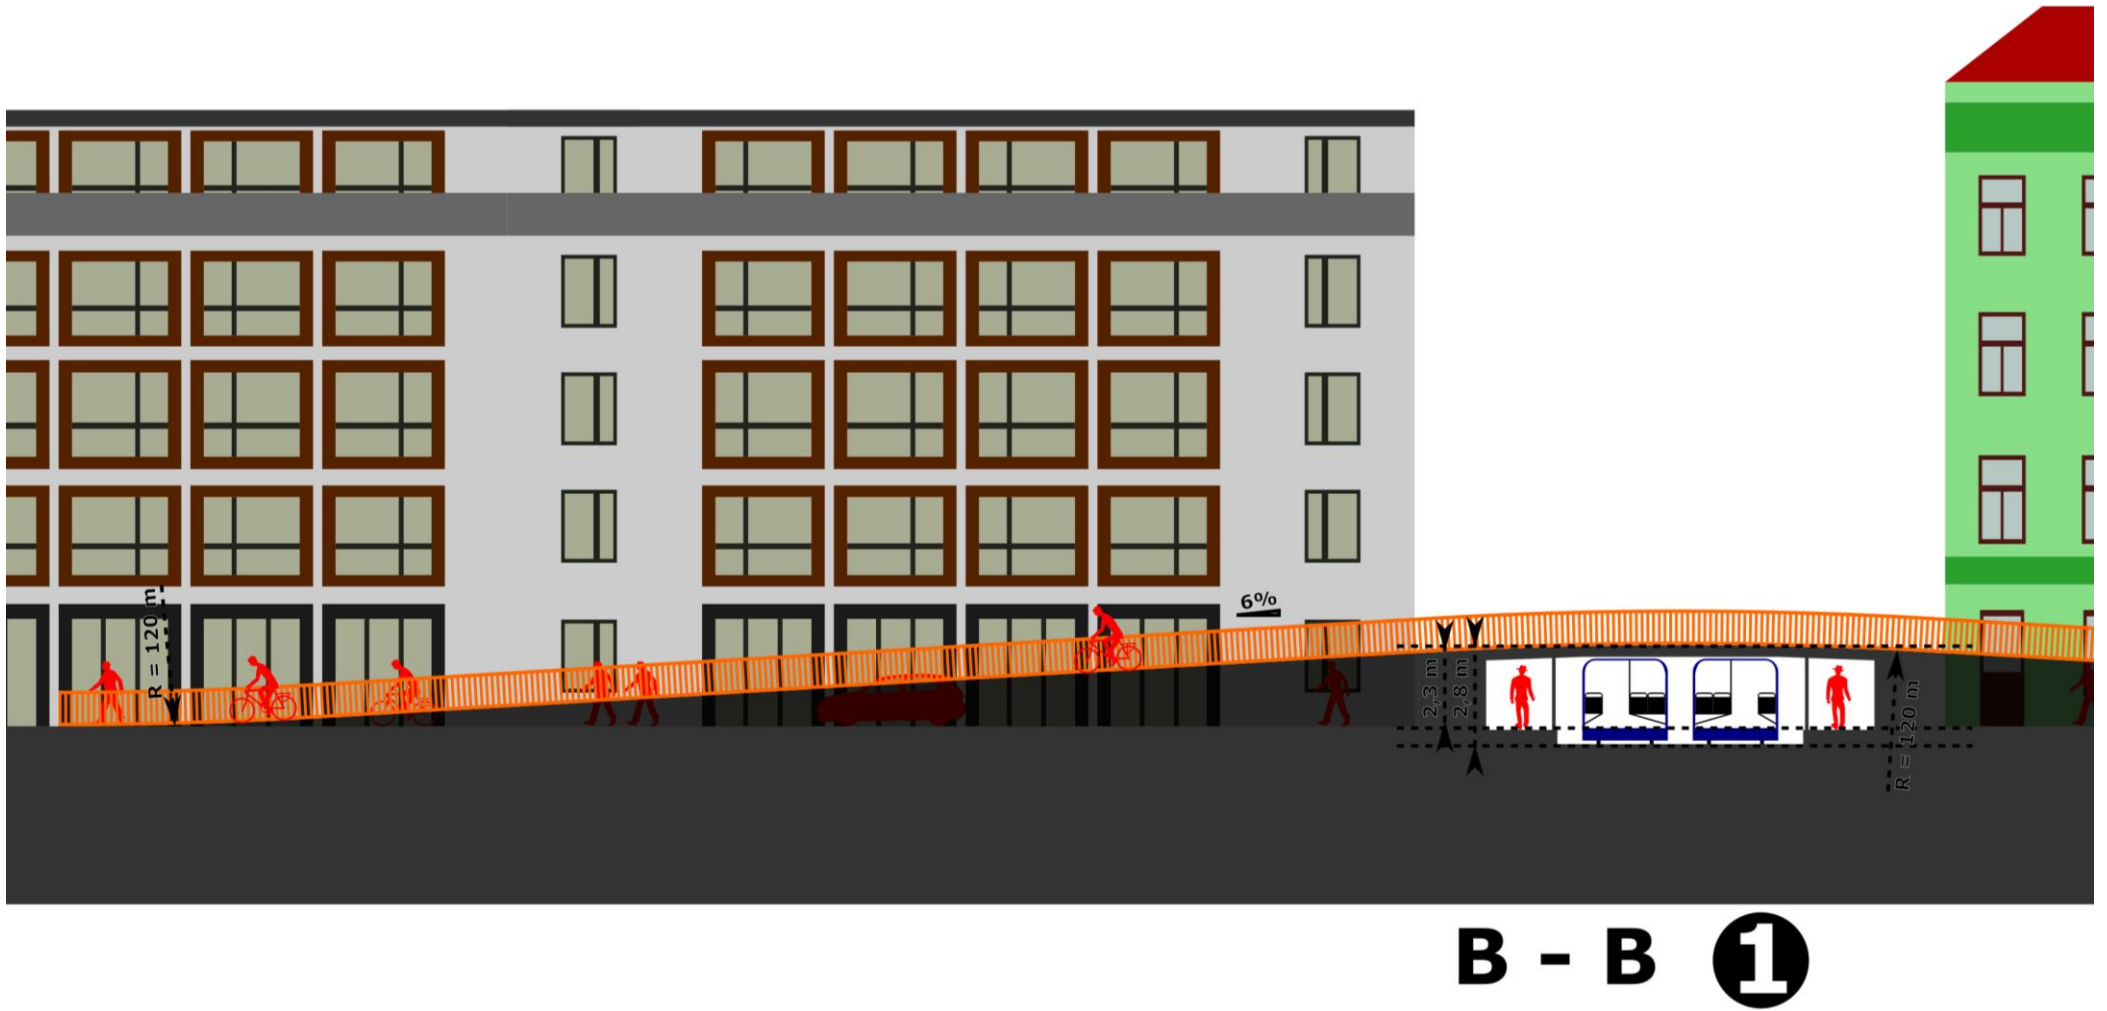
Detailed view of a longitudinal section of a road, crossing the LCRT line with a shallow underpass
